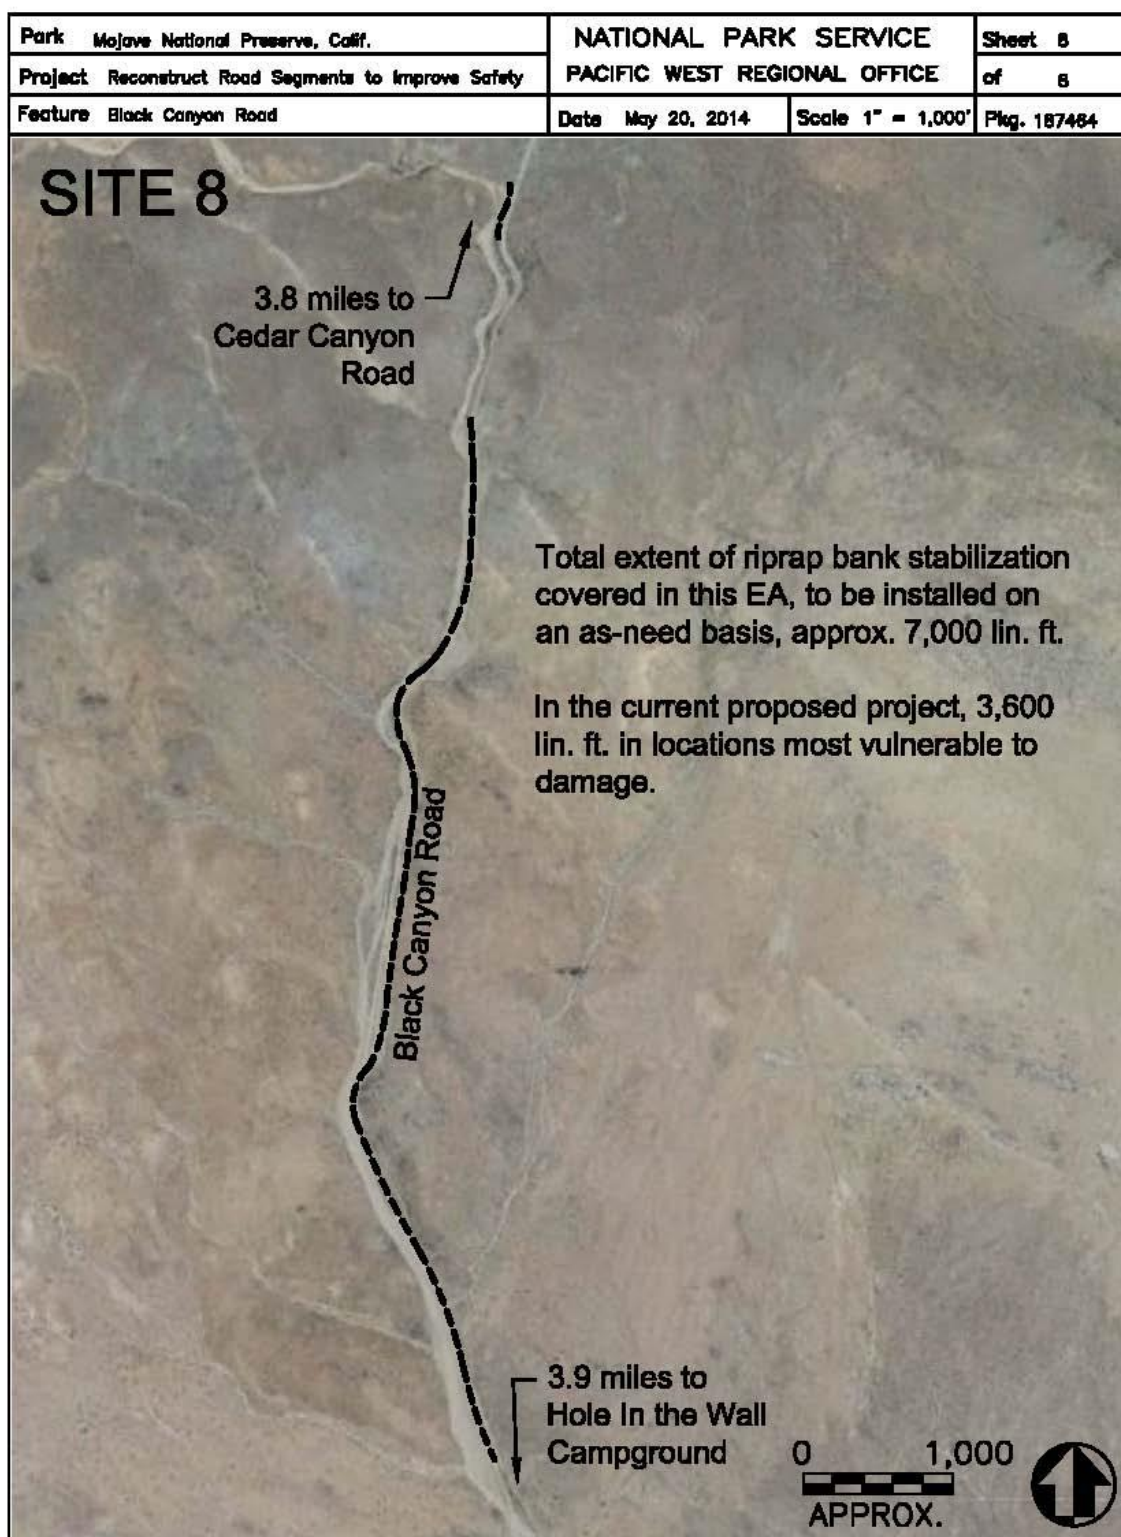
Black Canyon Road Bank Stabilization (Site 8)
